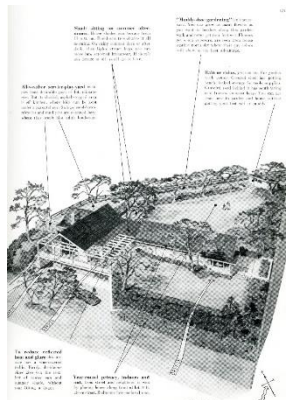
Labeled drawing of the site features readers should consider in this efficient home example. Source: House Beautiful. (1949b). Good Site Planning Can Double Your Outdoor Living. *House Beautiful*, 91(10), 173.
